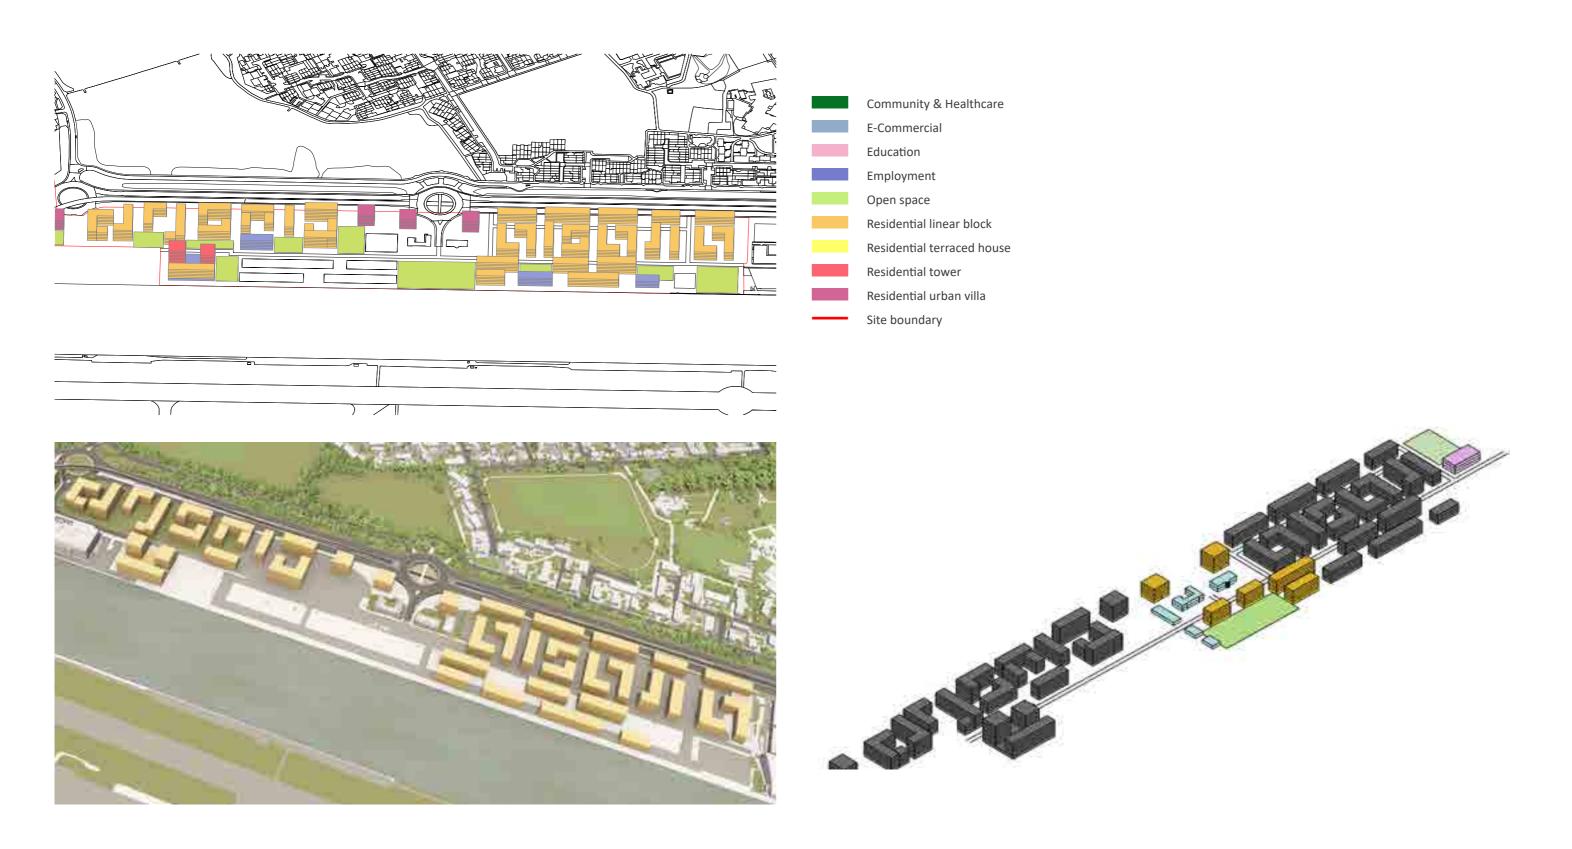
Site capacity testing (Reg 18): Beckton site within N3.SA1 Royal Albert North site allocation
